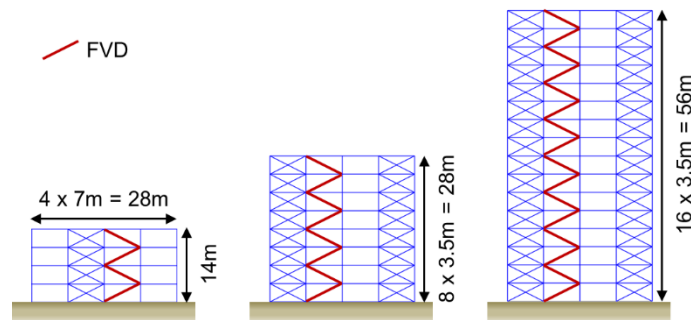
Elevation of office buildings with locations of fluid viscous dampers (FVDs)
